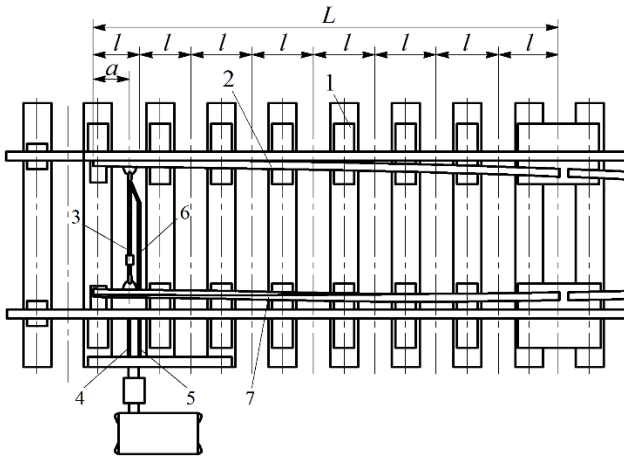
General view of the mechanism for determining the effort of switching: 1 – switching surface; 2, 7 – wits; 3 – connecting thrust; 4 – working thrust; 5 – first control rod; 6 – the second control rod
